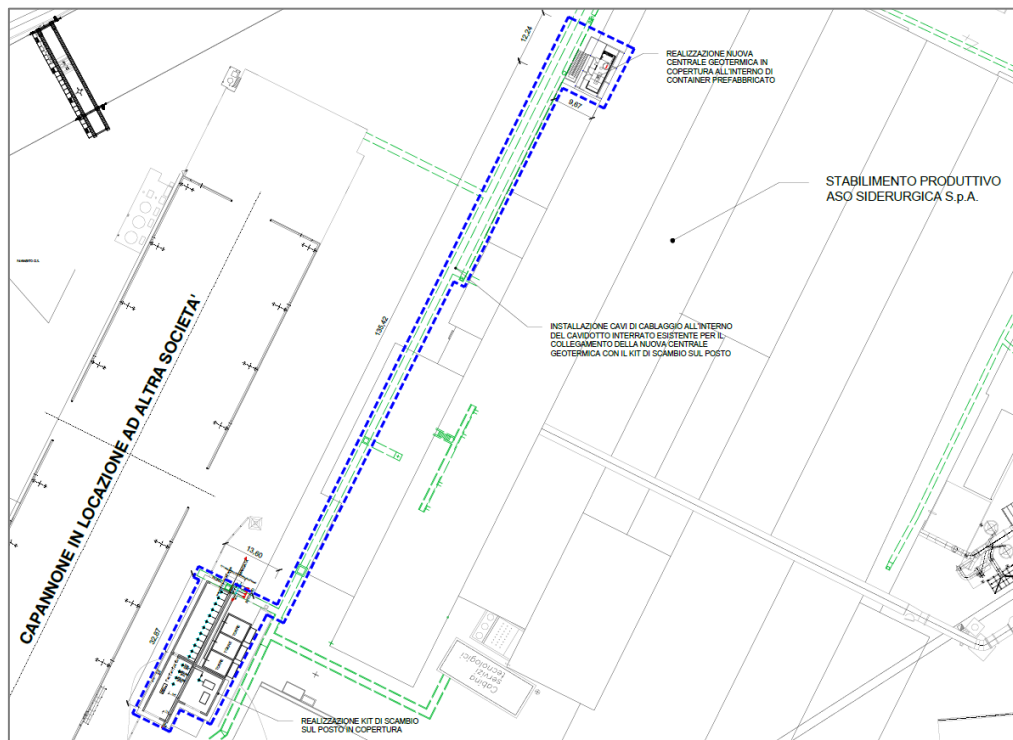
general plan showing position of on-site heat exchanger kit and geothermal plant.
